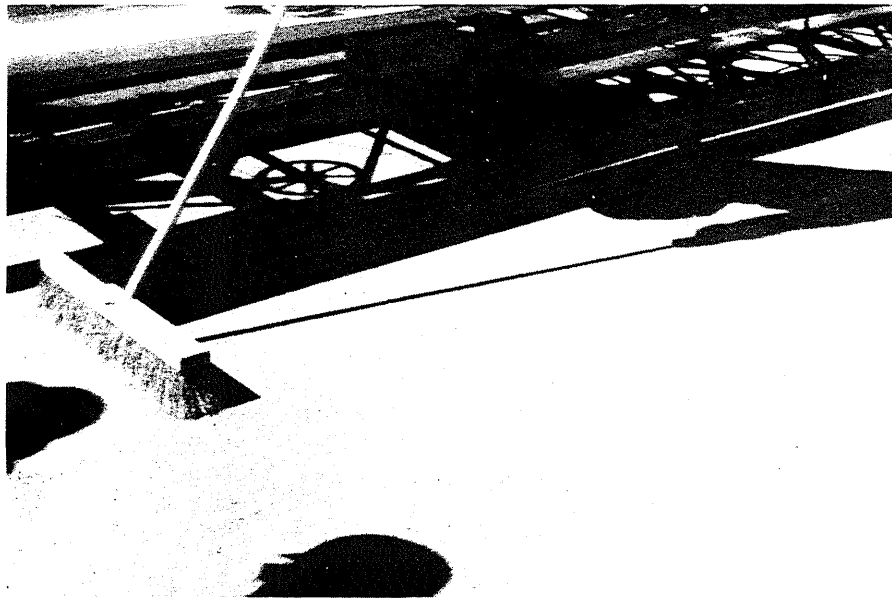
APPEARANCE OF BRIDGE DECK NO.35W-40-5.00
